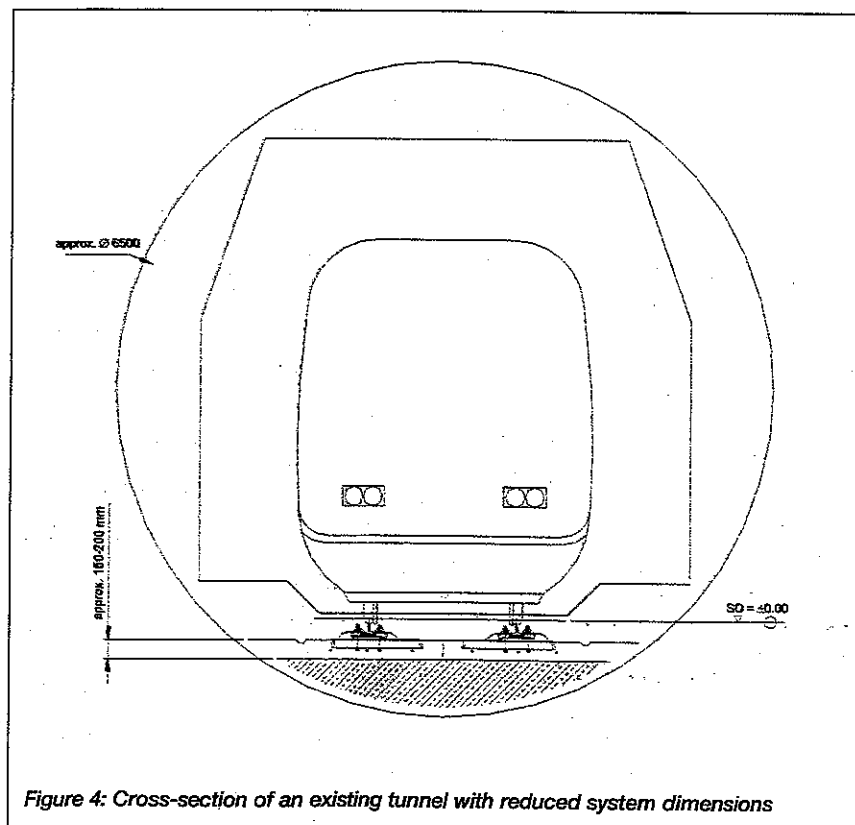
Cross-section of an existing tunnel with reduced system dimensions
